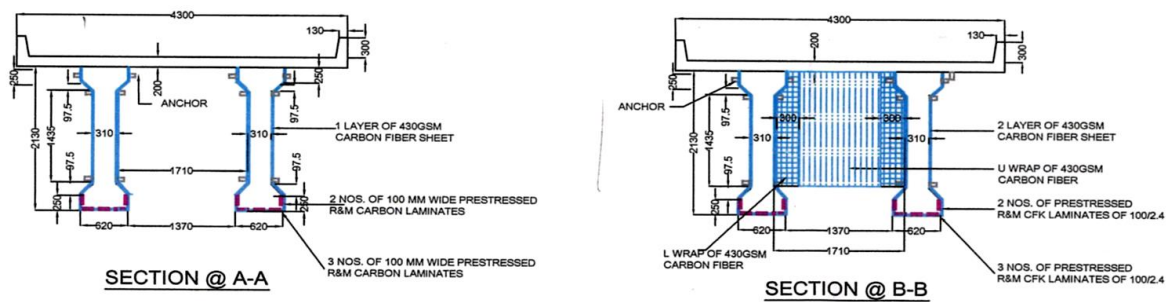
Sectional elevation of Ratlam Railway Bridge PSC I girders
